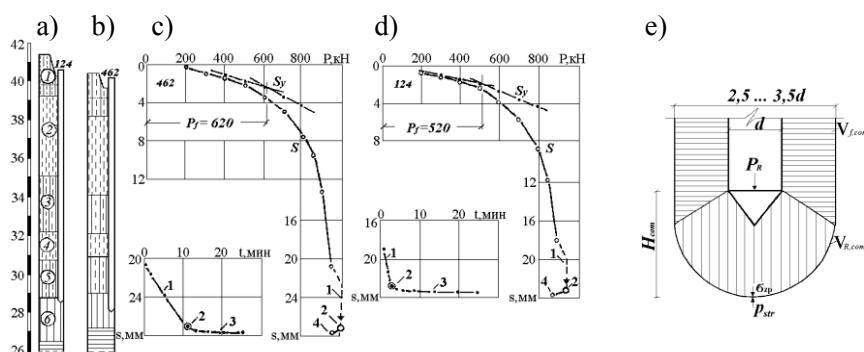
Test results of soil by piles with vertical compressive load: a, b) Engineering - geological profile sections of the test piles; c) and d) Graphs of settlement dependence on load. 1. Pile 'jump' failure. 2. Completion of pumping the oil into chamber of the jack. 3. Process of load reduce and strain stabilization. 4. The load counterbalanced by the resistance of the soil; e) Groundwater level after pile installation. $V_{f,com}$ - the volume of compacted soil around the pile shaft. $V_{R,com}$ - compacted soil core below the pile toe.
